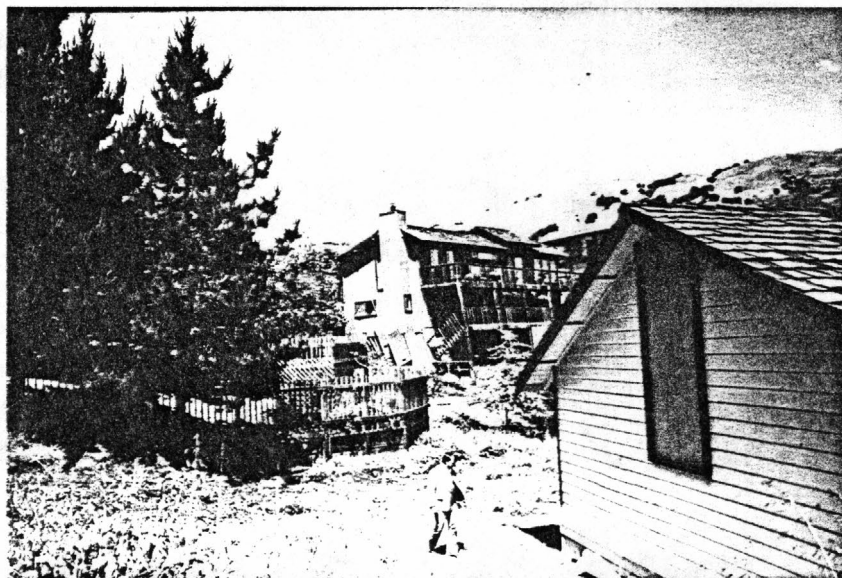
Jackson Oaks housing tract (location (69)). House #1 from next to house #2 (house numbers from Figure 3). Note unshattered and rotated shear panels on house #1 which appear to have provided little shear protection.
